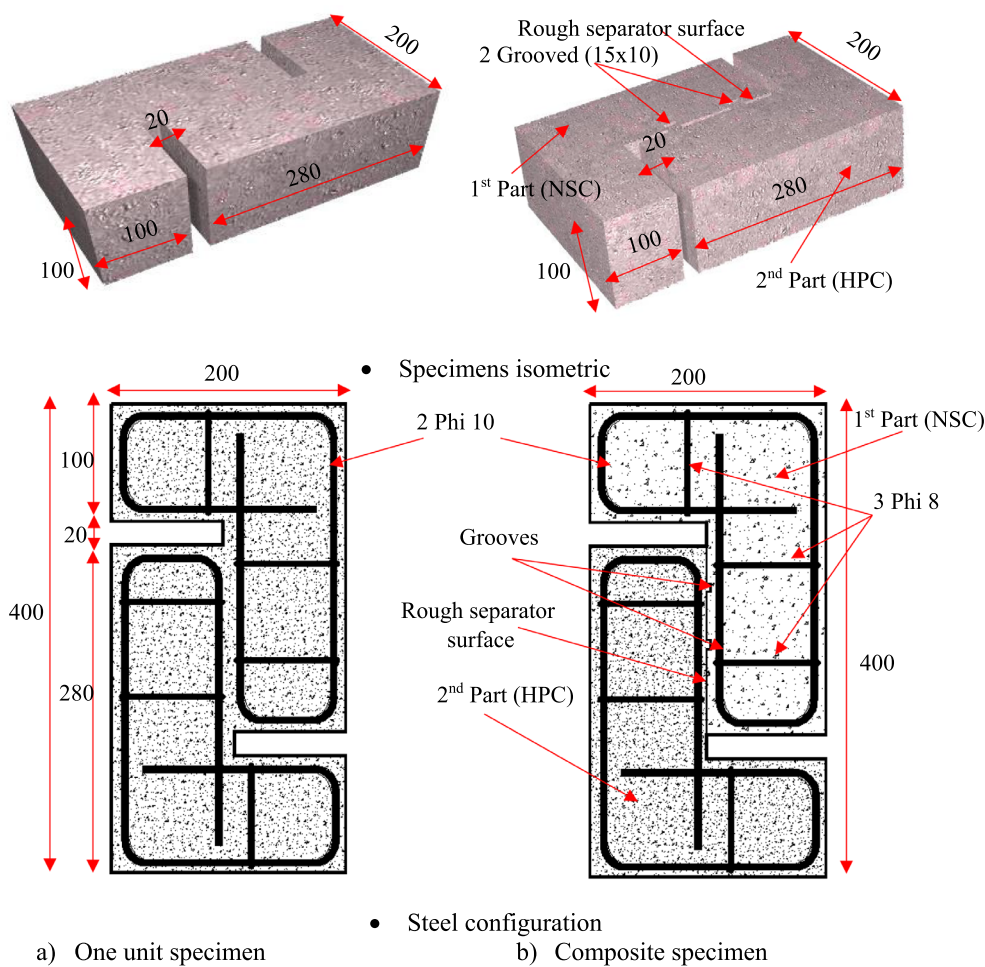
Specimen dimensions and reinforcement details (all dimensions in mm)
